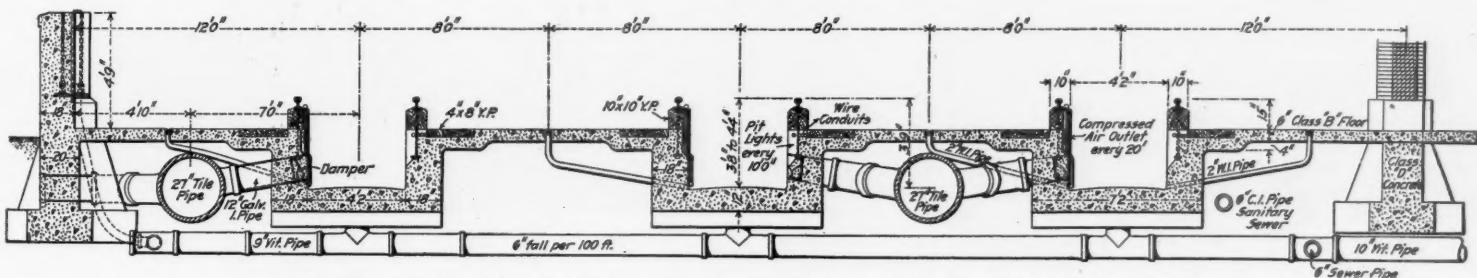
Typical Cross-Section Through Inspection Pits; North White Plains Terminal.
